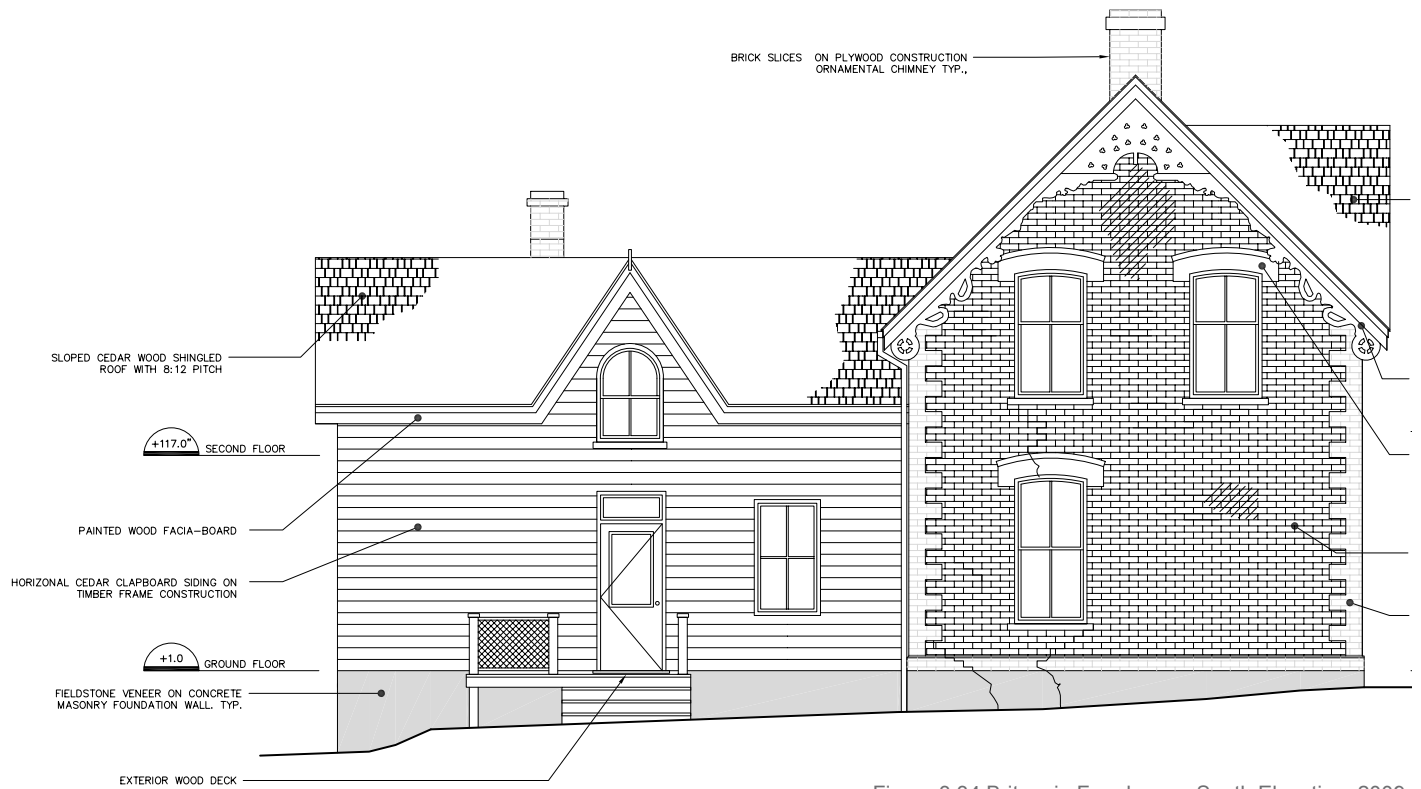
Britannia Farmhouse. South Elevation. 2009.
